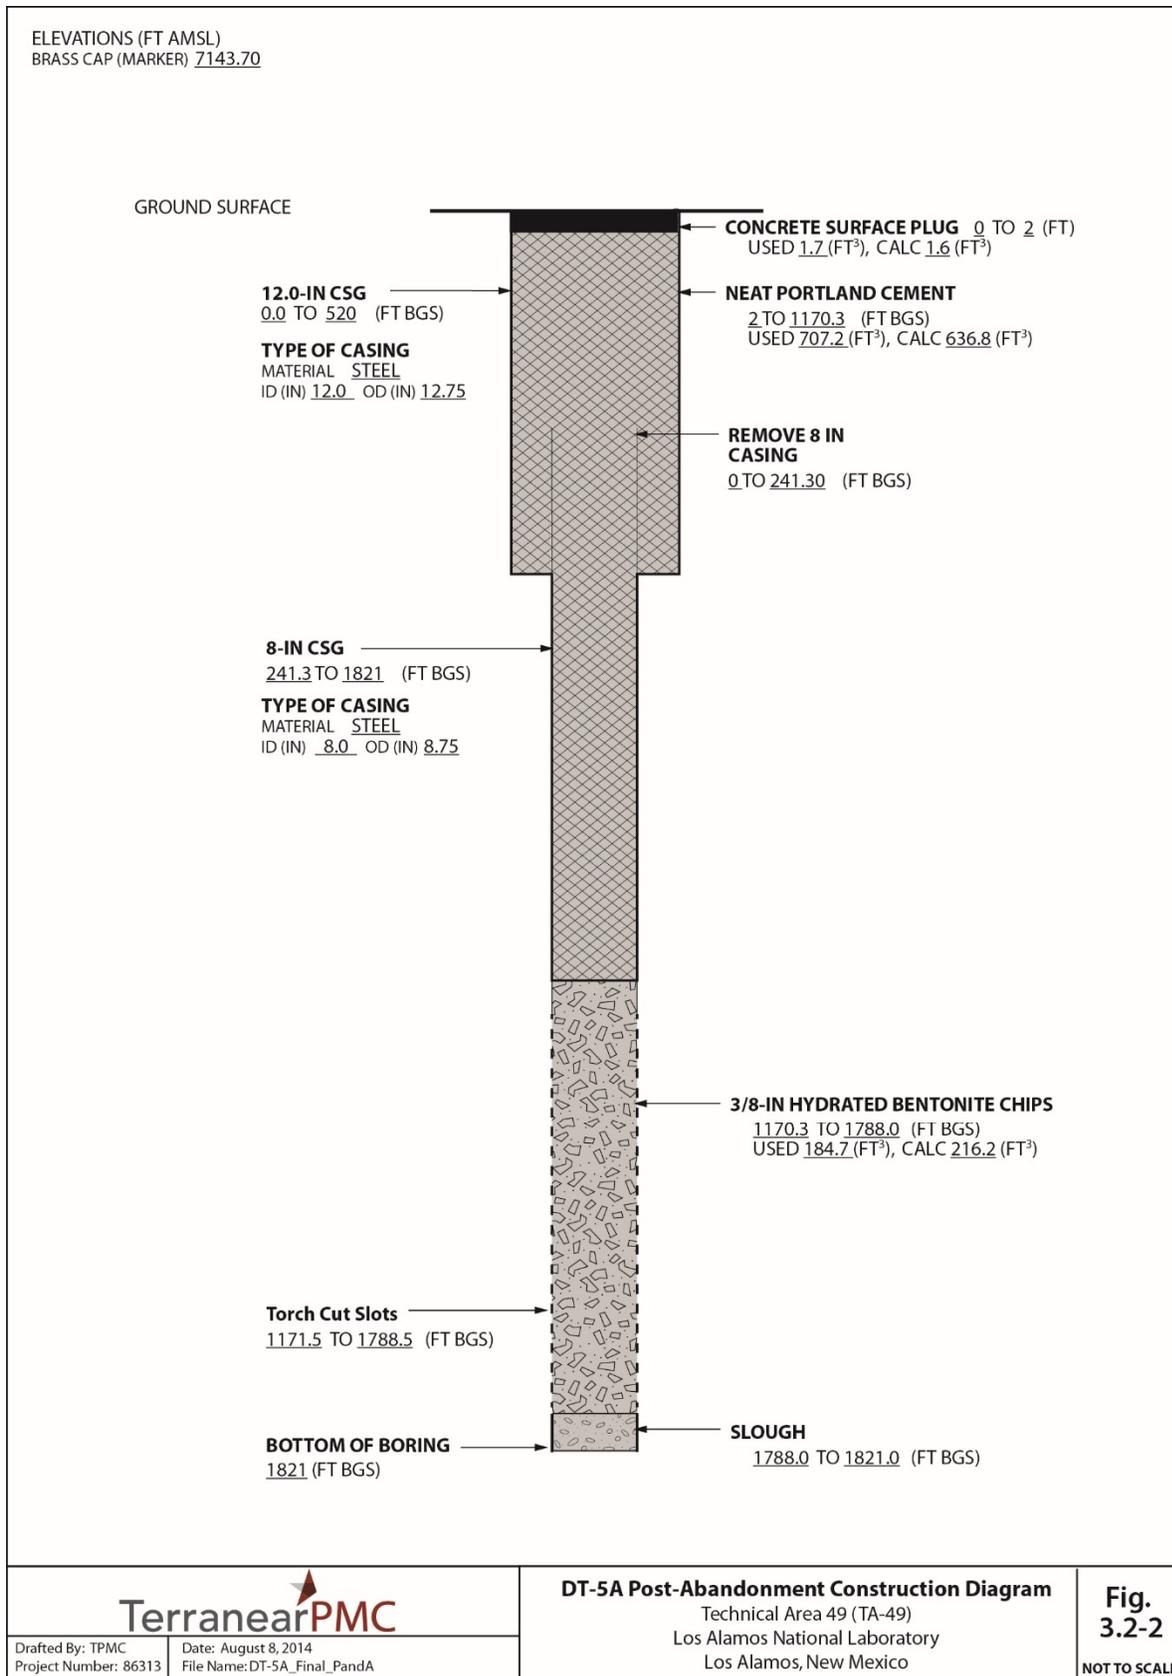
Test well DT-5A post-abandonment construction diagram
